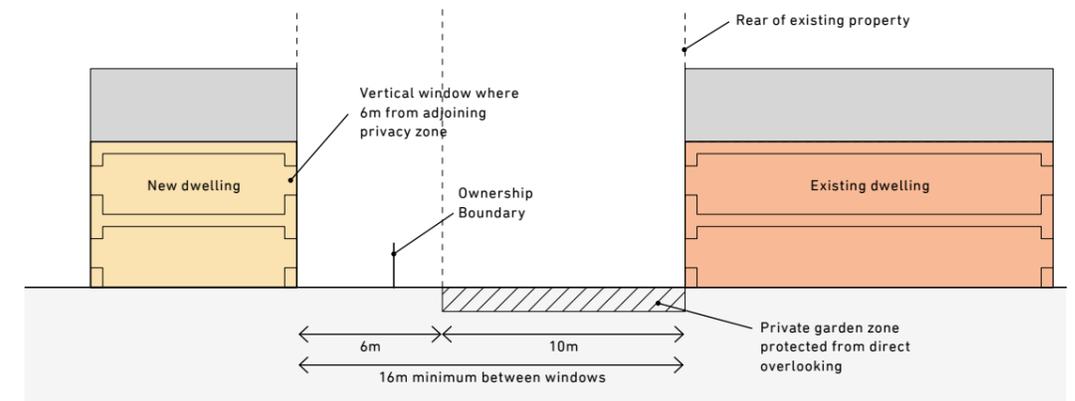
Conventional windows serving habitable rooms in new dwellings should be at least 6m from the 10m private garden zone
